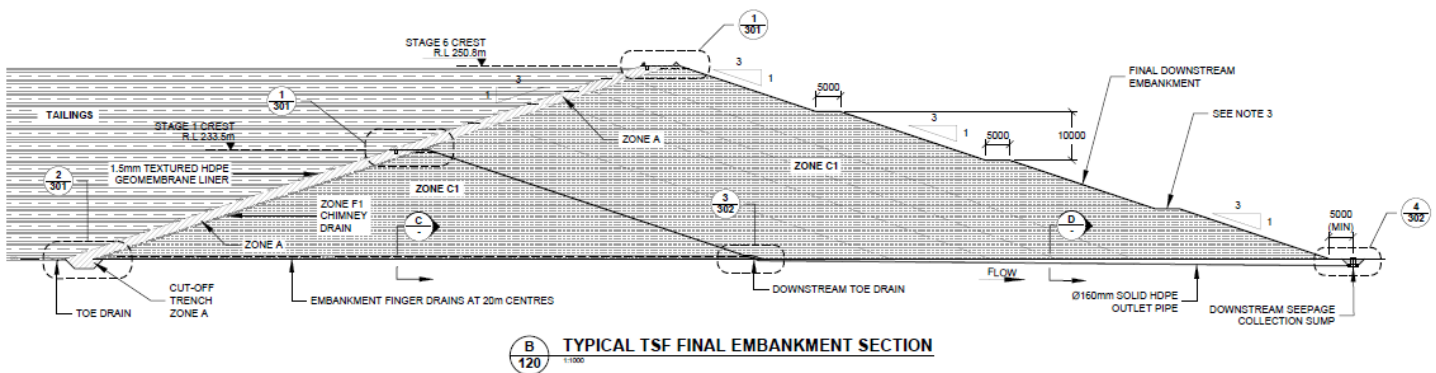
TYPICAL TSF FINAL EMBANKMENT SECTION
